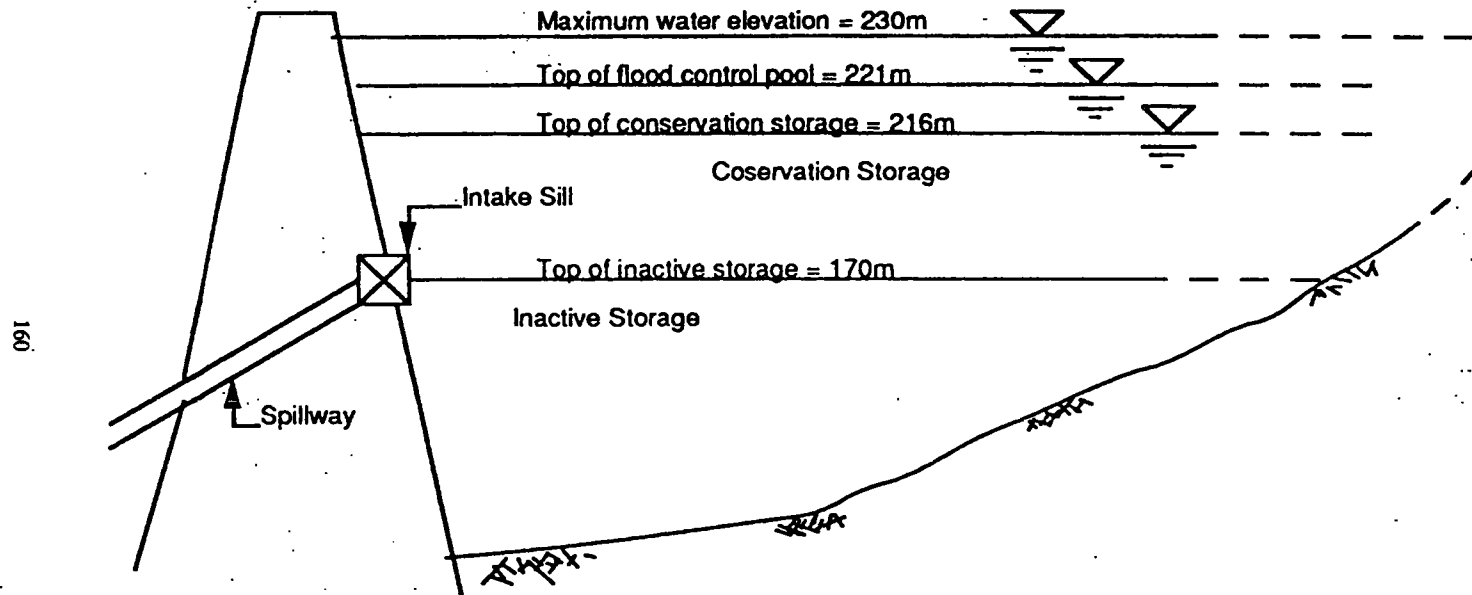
Schematic diagram showing the elevations of designed storages at Pantabangan dam.
